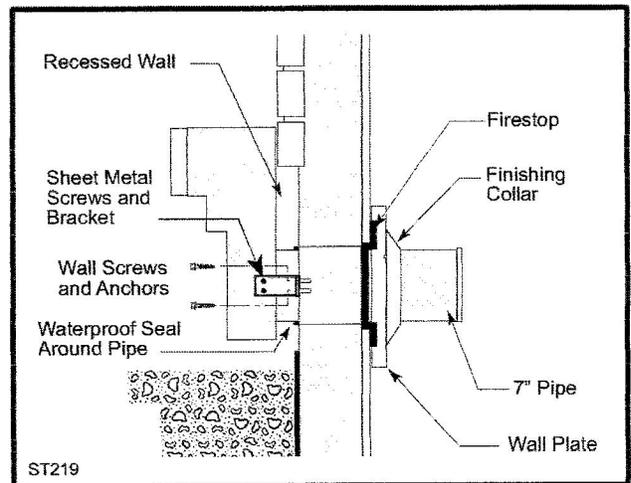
Use extension brackets to mount snorkel against recessed wall.
